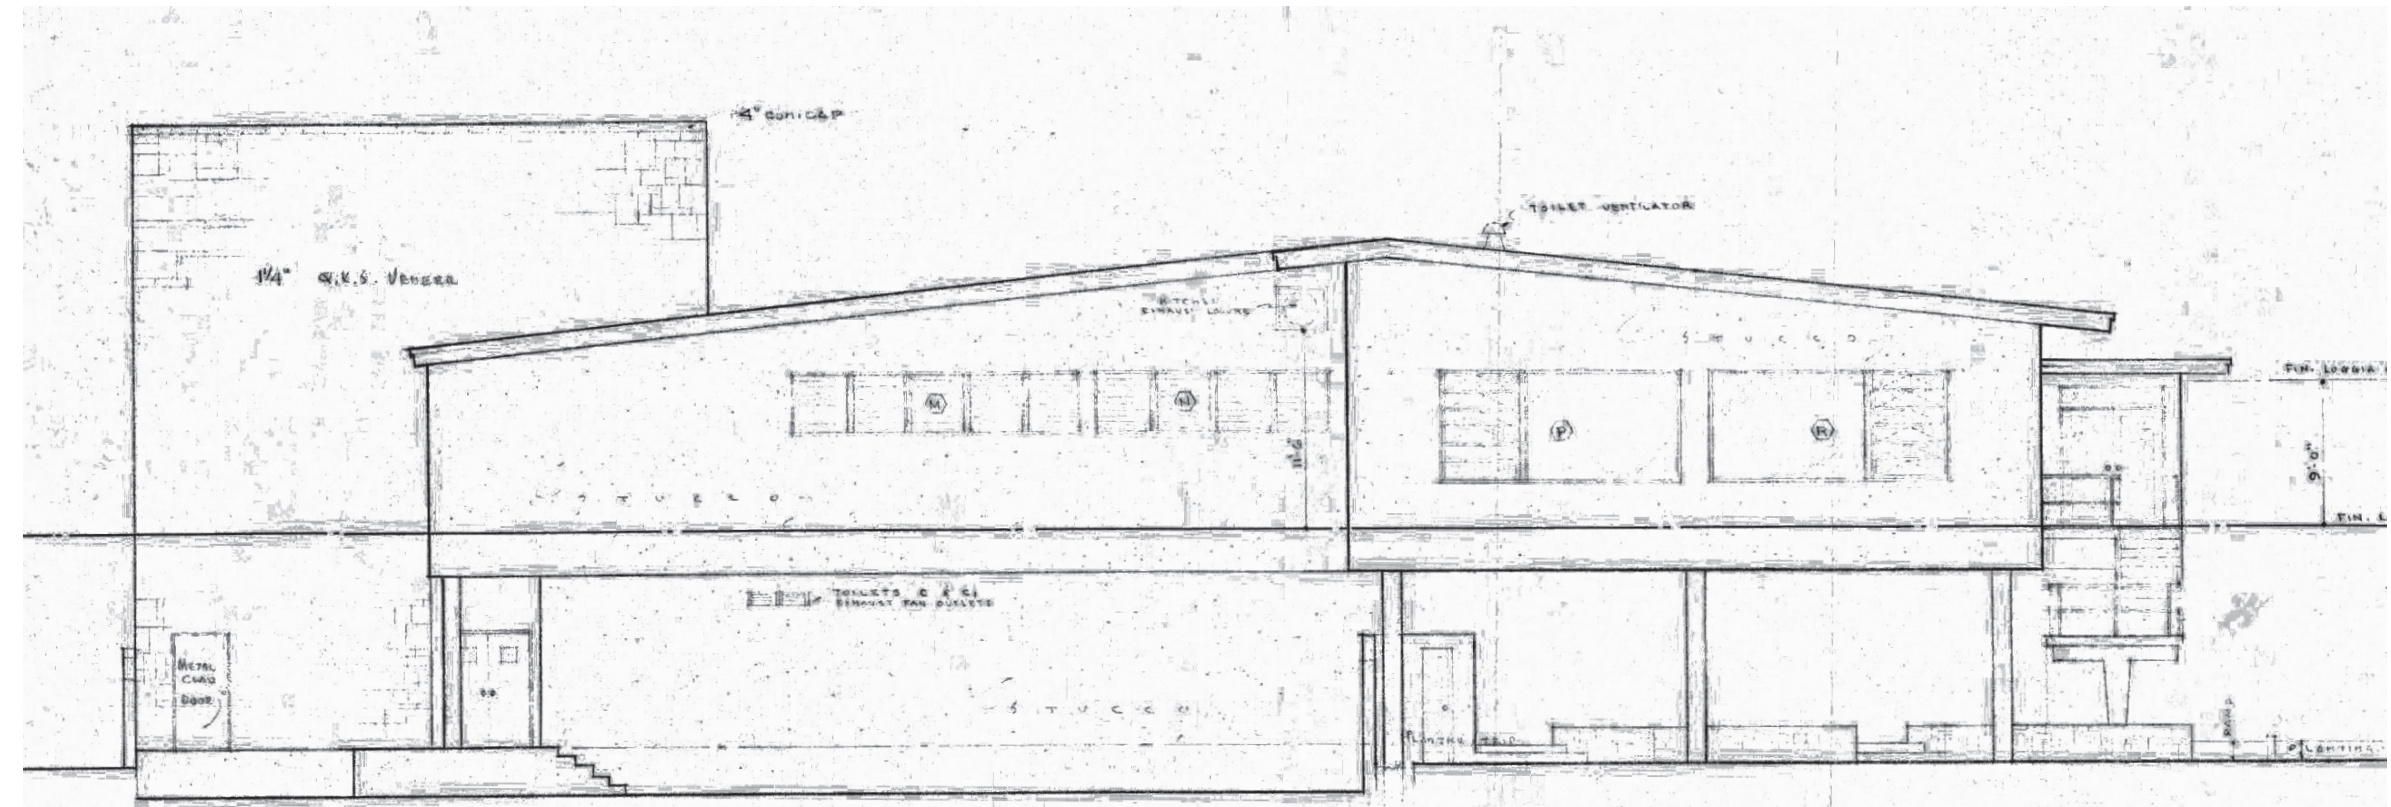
IMAGE S: ORIGINAL BLUEPRINT SOUTH ELEVATION (KECK, JR. ARCHITECT 1956)
